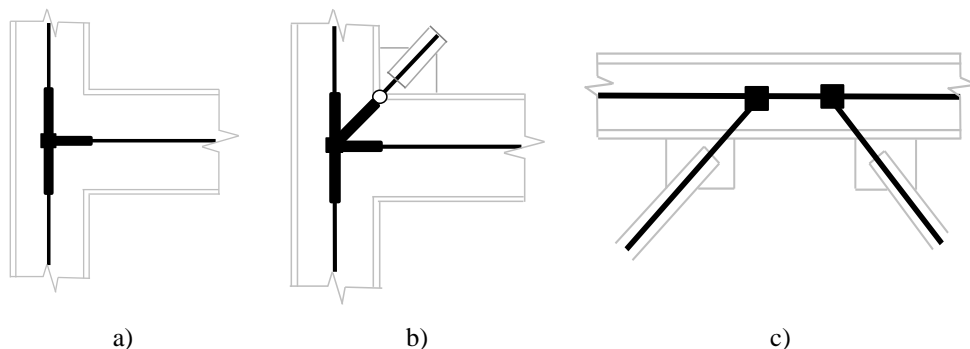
Model of connection types: beam-column joint (a), beam-brace column (b), brace link (c)
